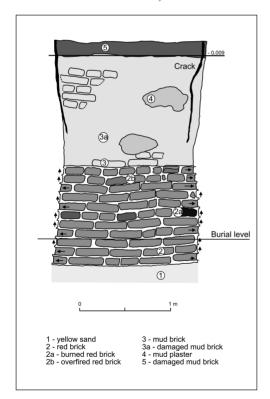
Section view of inside face of northwestern wall in Room 17 (Drawing M. Woźniak, A. Pląskowska)
